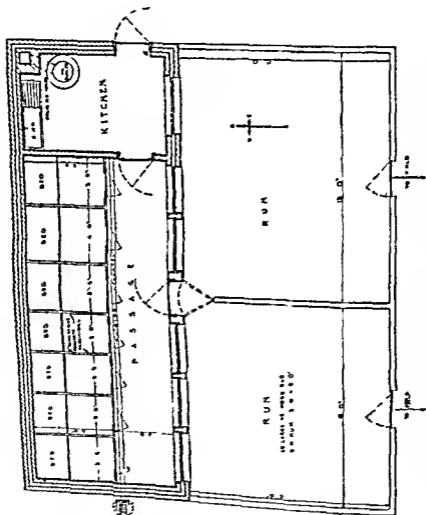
Plan of Dog Kennels arranged in a single row. Only seven kennels are shown, but the building would naturally be continued to a greater length.
